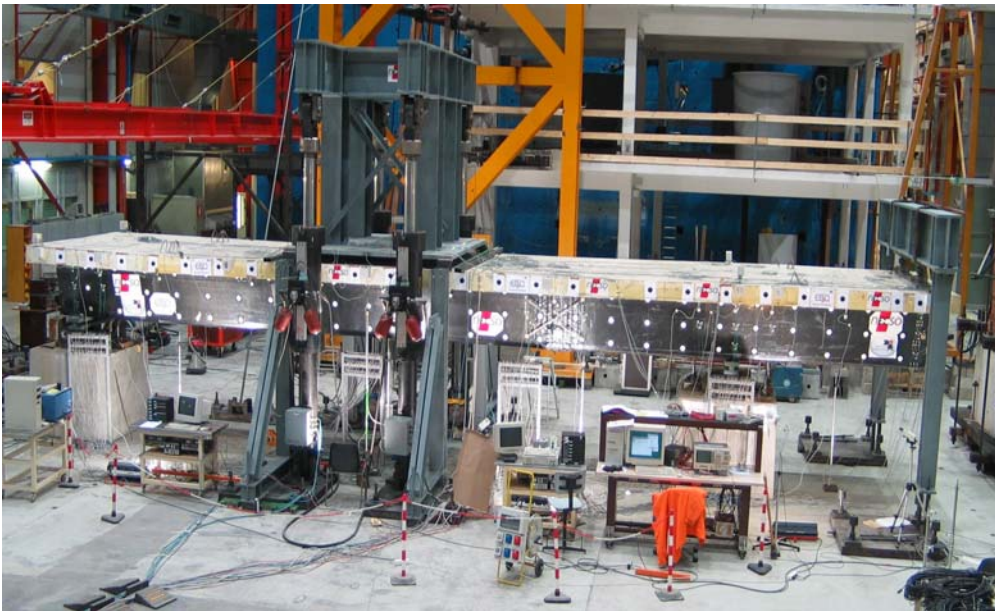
PUMACOM bridge with full instrumentation, ready for testing
